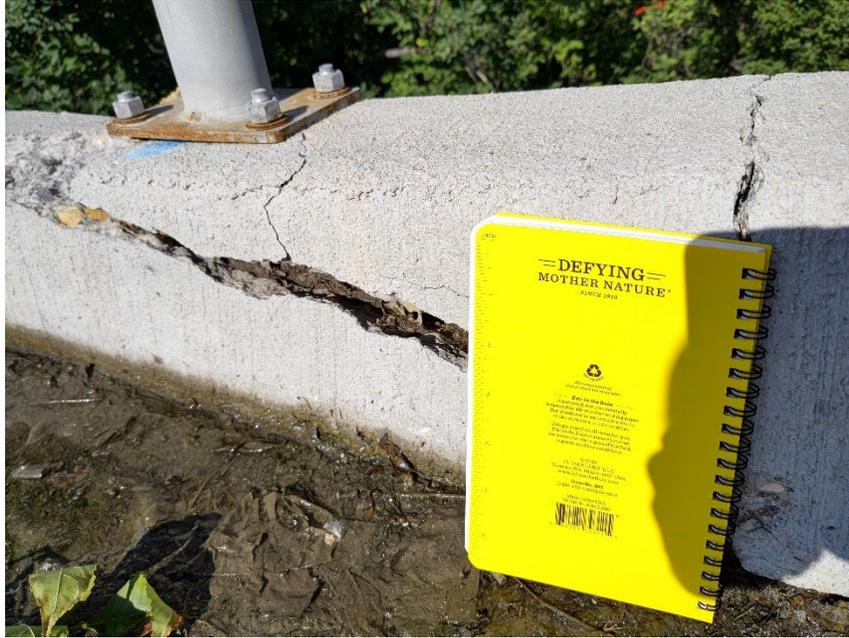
Crack in west curb of the settled sidewalk slab
